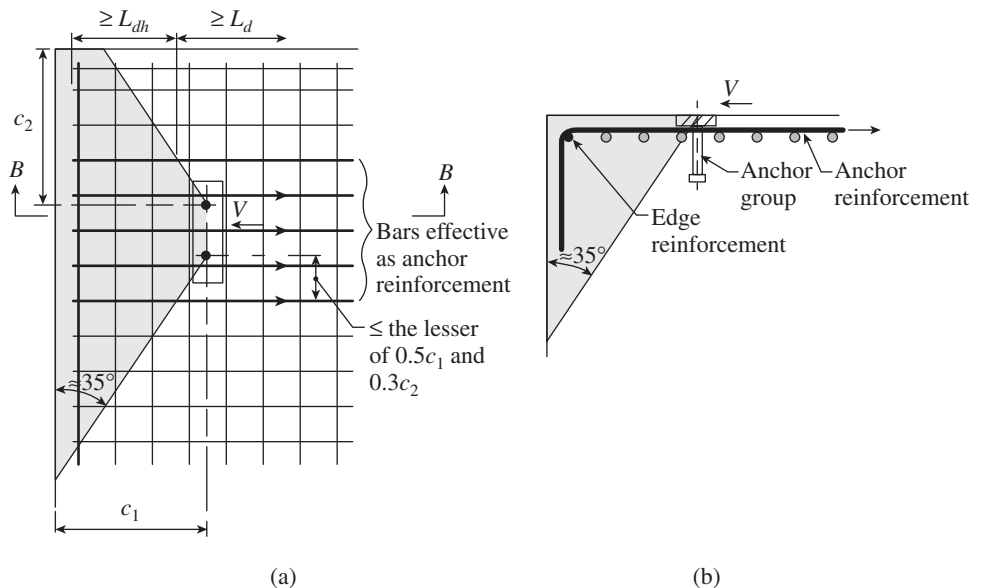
Edge and anchor reinforcement for shear (a) Plan (b) Section B-B (Reprinted with permission from ACI)
